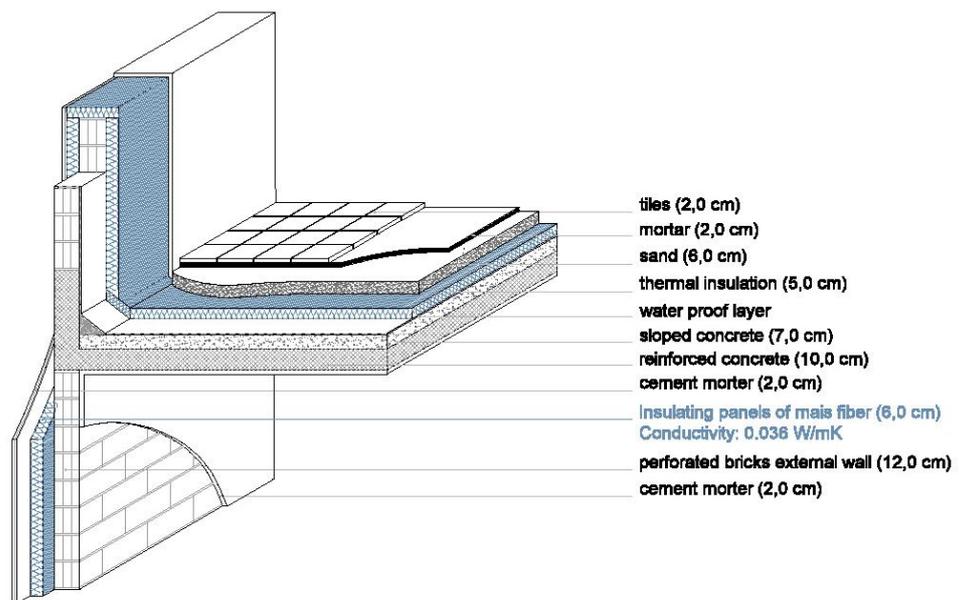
Detail 03 - wall roof connection after intervention from inside
